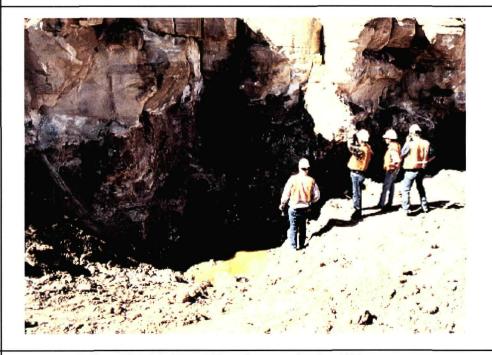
Tailings Pile #1-2, Ground Water Seepage, October 1999
